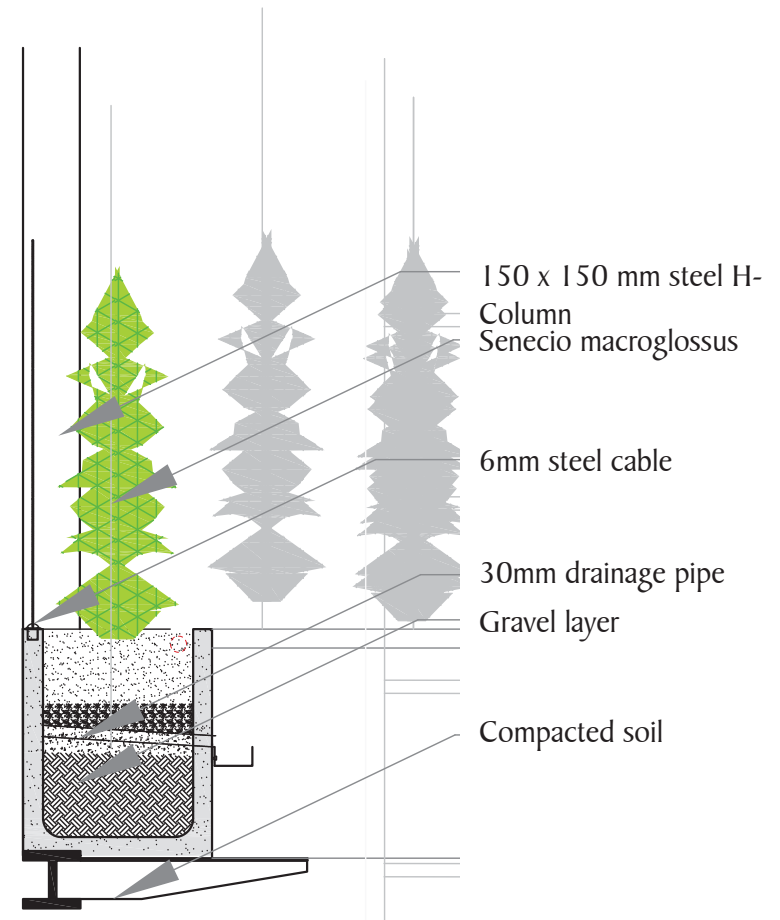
Detail: Vertical garden(Author, 2008) Scale 1: 20
